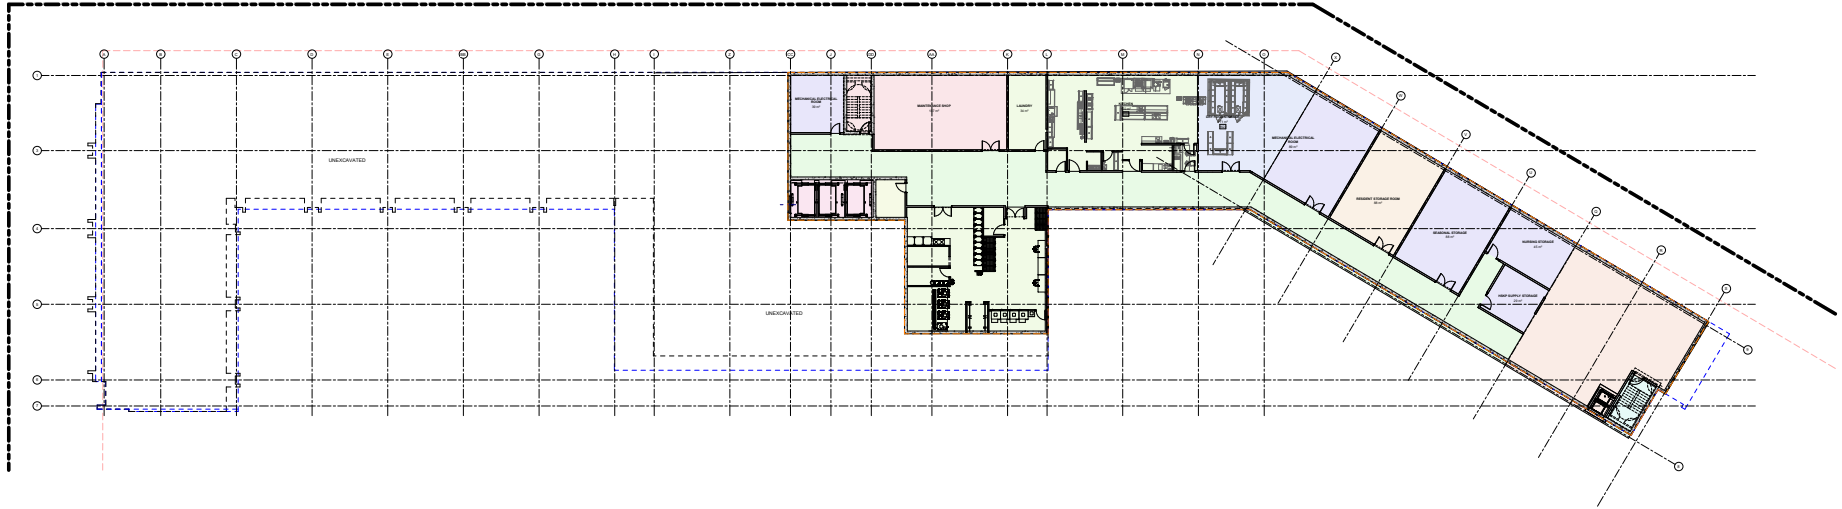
BASEMENT FLOOR PLAN (CHAMBERLAIN ARCHITECT SERVICES LTD.)
